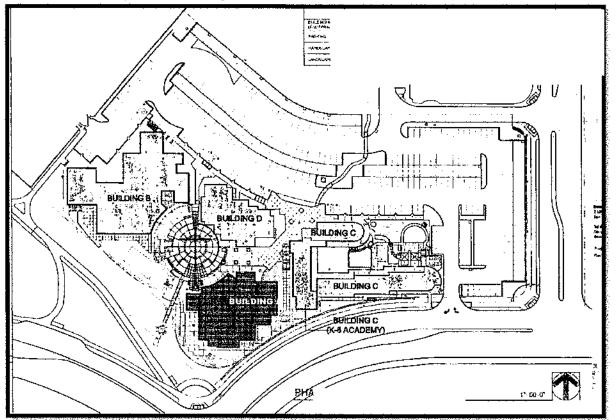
Centerpointe Presbyterian Church Master Site Plan
